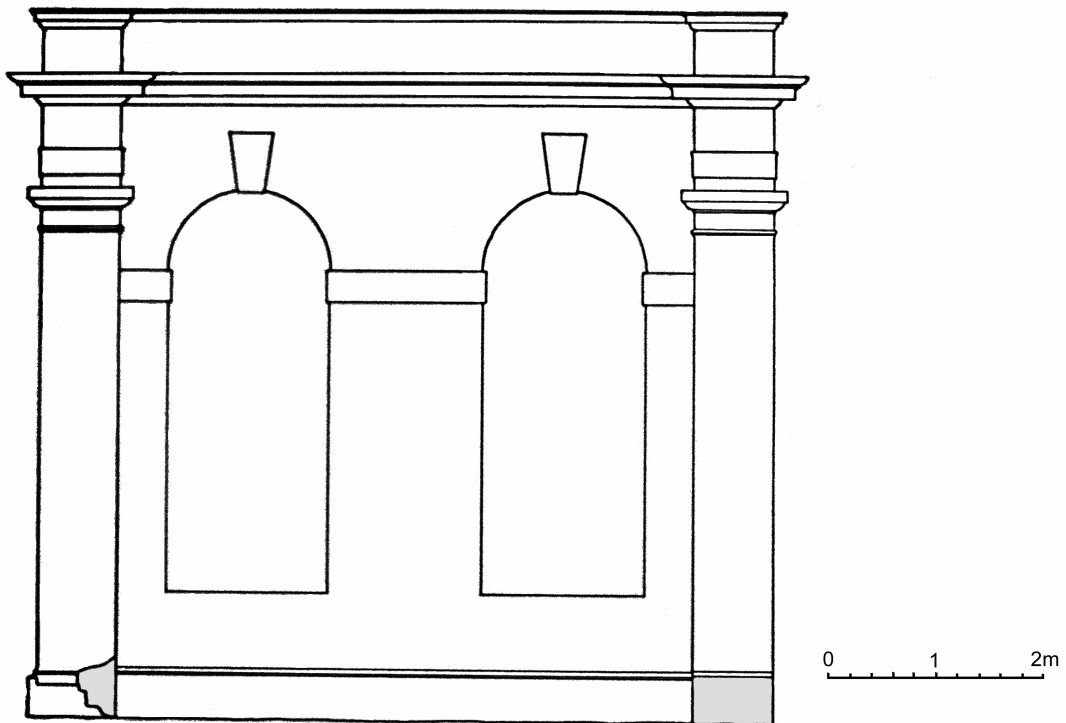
The Orangery wall bay 7. The grey areas are damage or poor repairs.
